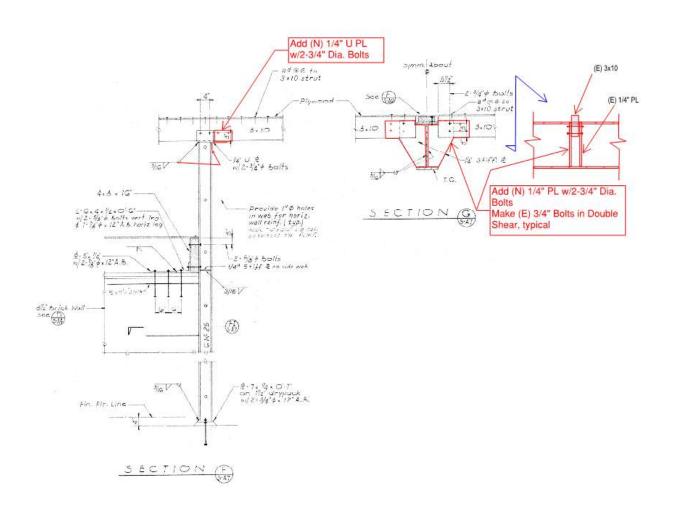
Library High Roof Plan, Proposed Strengthening of Strut Connections
